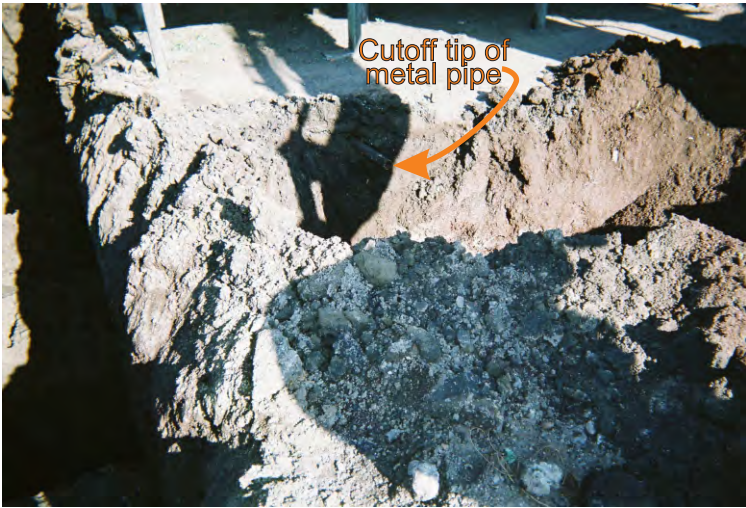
View to the north of the former gasoline UST trench with cut off metal pipe sticking out of side wall.
